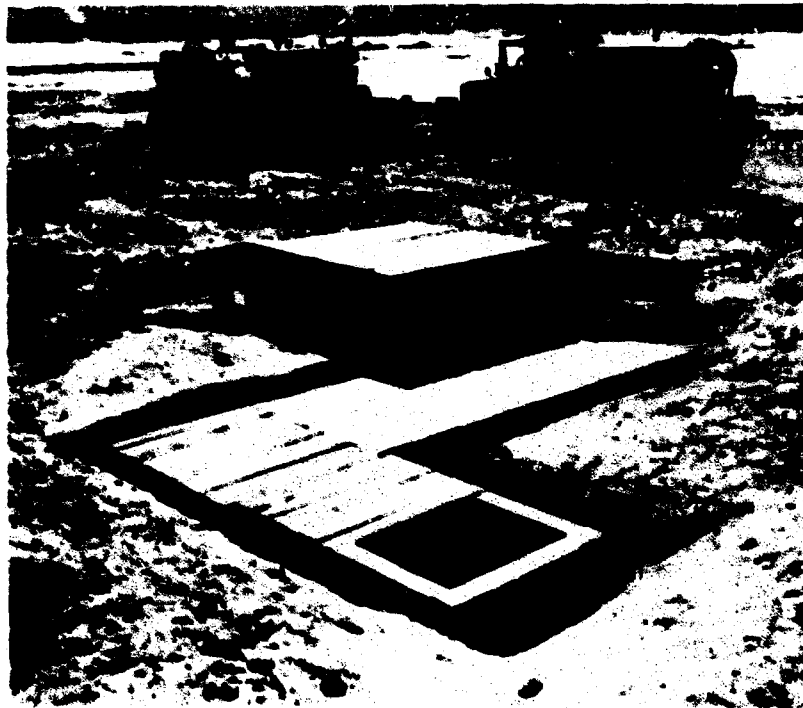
7' x 7' machine gun emplacement completed except for backfill and cover.
